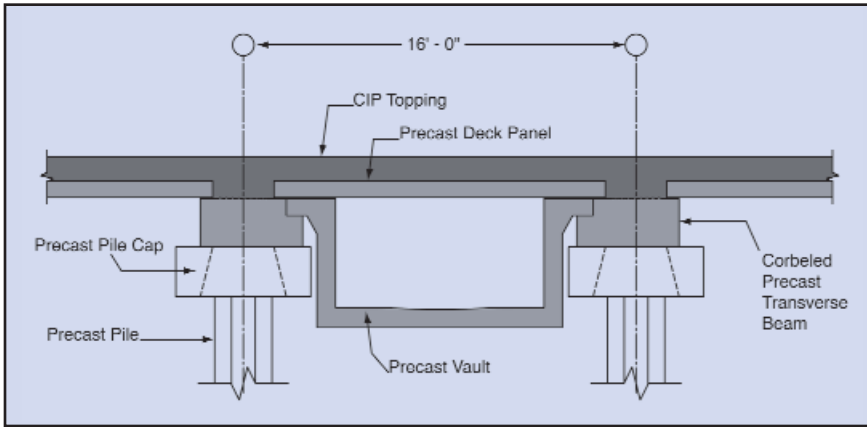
Typical precast concrete utility vault and connection detail to transverse beam showing clearance of pile cap.
